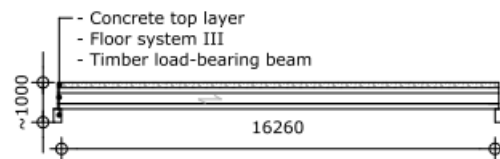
Cross-section B-B of the prefabricated timber floor system III plus a concrete top layer in mm
